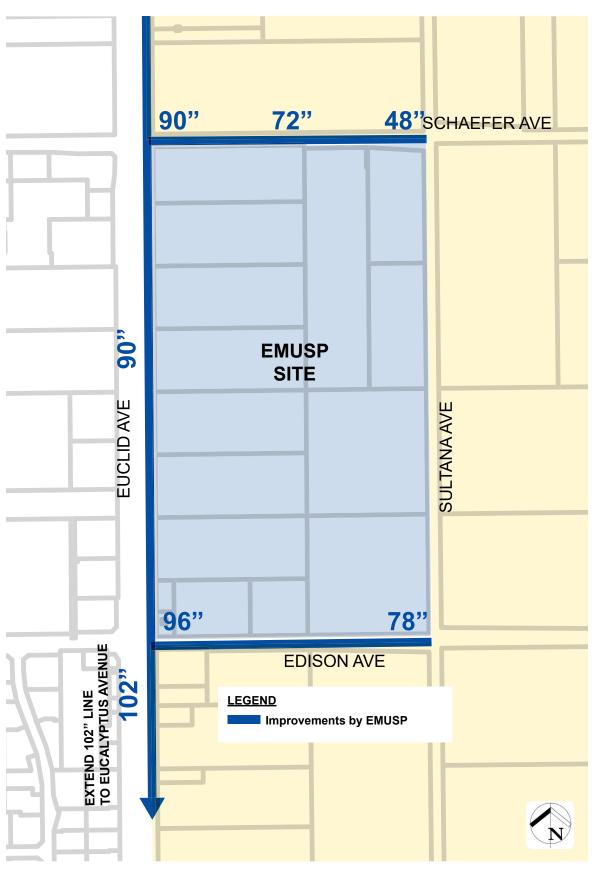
SPECIFIC PLAN STORM DRAIN PLAN
